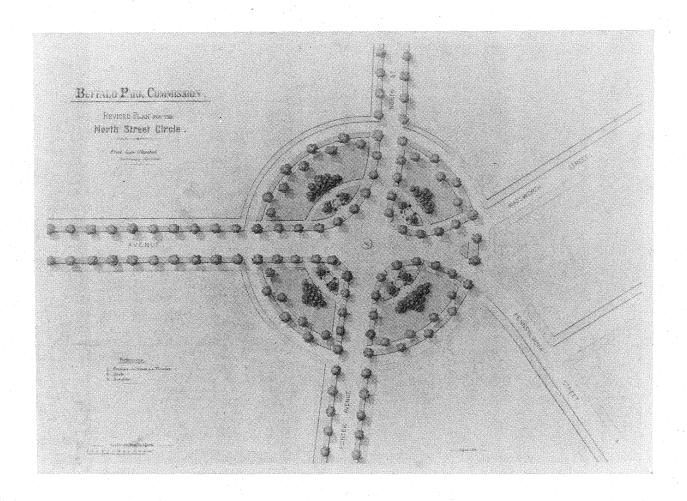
Revised Plan for North Street Circle, Buffalo Park Commission, Fred. Law Olmsted, Landscape Architect. Courtesy Beveridge collection.
